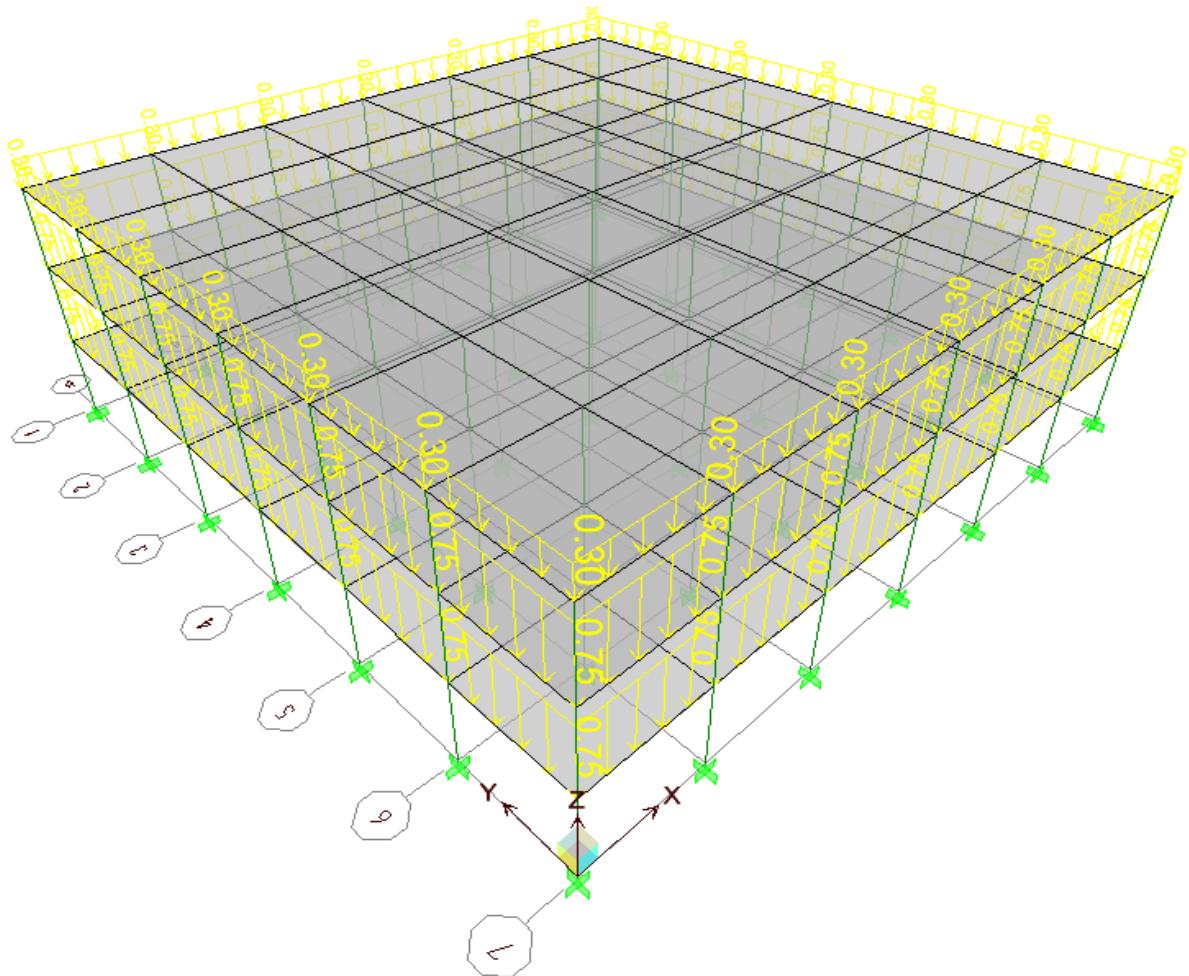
Applied uniformly distributed linear load on perimeter walls
